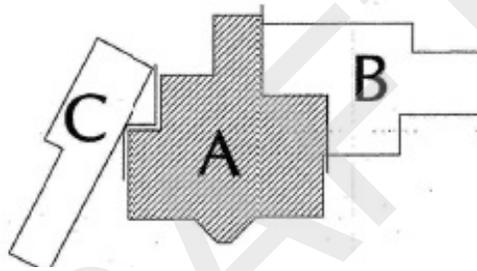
shows the three major components of the jail and court complex. The services building [C] is located at the far left of the diagram. It is separated from the jail facility and a freestanding firewall has been constructed between the two components. The new jail facility [A] is in the center of the complex, and is connected to the court facility [B] that was created by renovating an existing structure.
